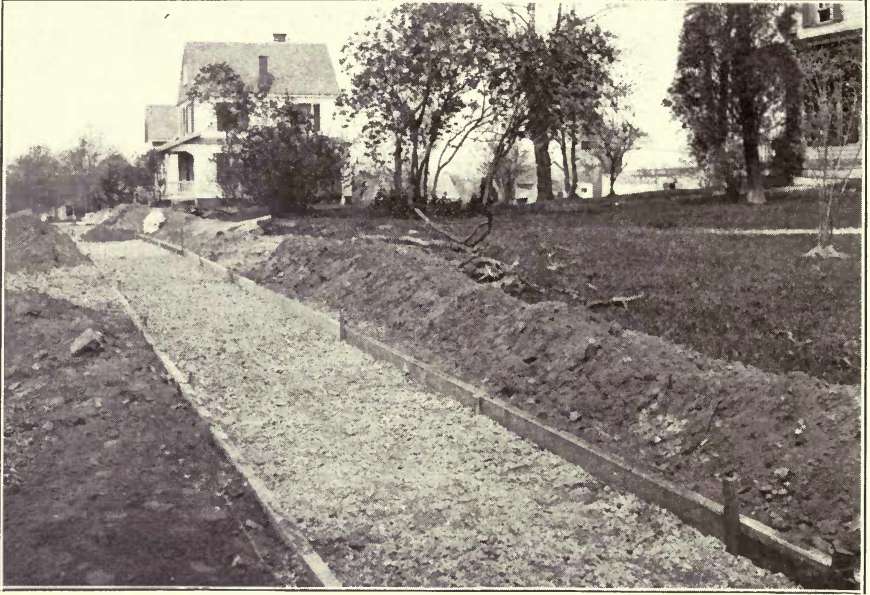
CINDER FOUNDATION FOR CONCRETE SIDEWALK.
